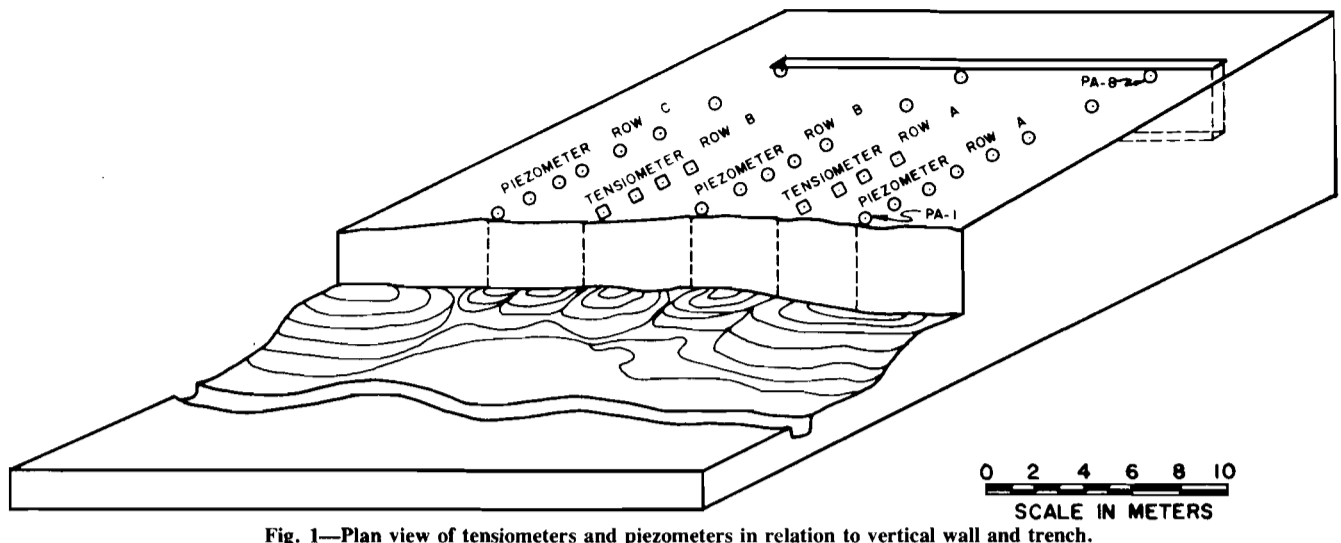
Plan view of tensiometers and piezometers in relation to vertical wall and trench.
